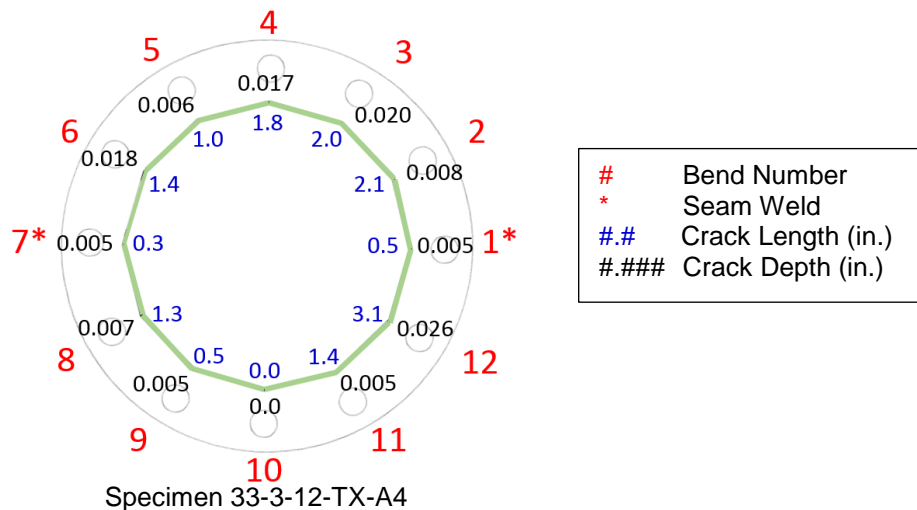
Specimen 33-3-12-TX-A4: Initial Cracks at the Beginning of Test 3
